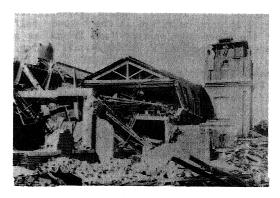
Damage of Mino-Owari earthquake, 1891 to unreinforced brick masonry building (spinning factory)
